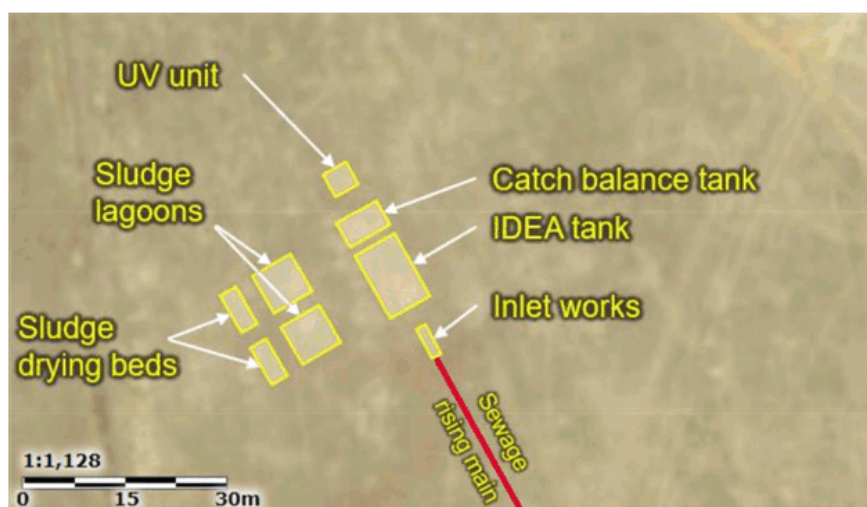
Springdale treatment sub-option C – proposed STP layout
